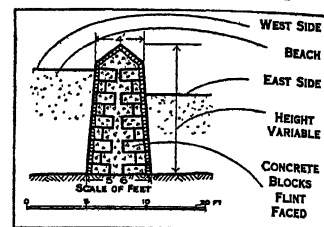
CROSS-SECTION OF CONCRETE GROYNES AT HASTINGS, SUSSEX
